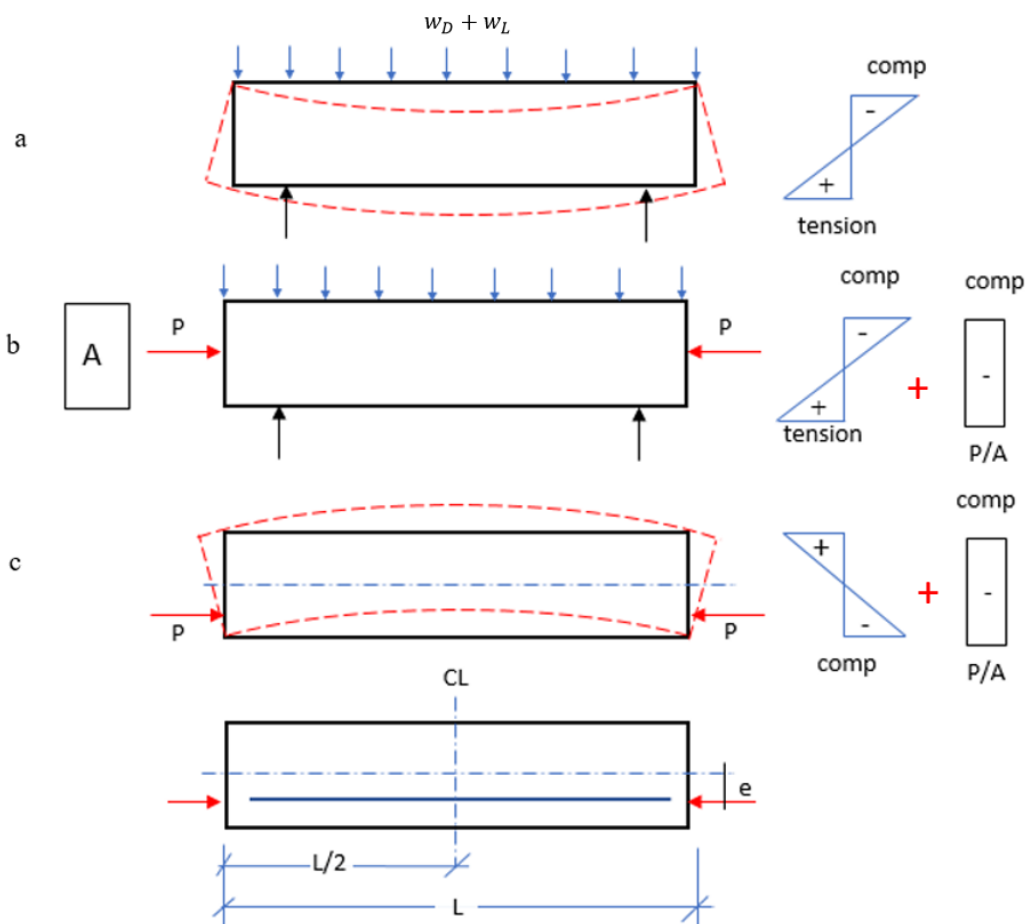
Stresses schemes of prestressing rectangular concrete beam
